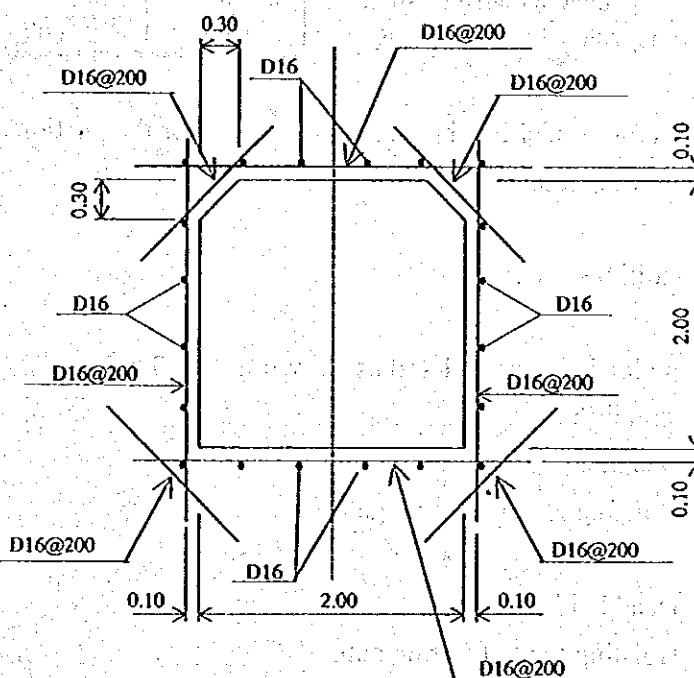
Reinforcement Arrangement of Typical Section of Tailrace
